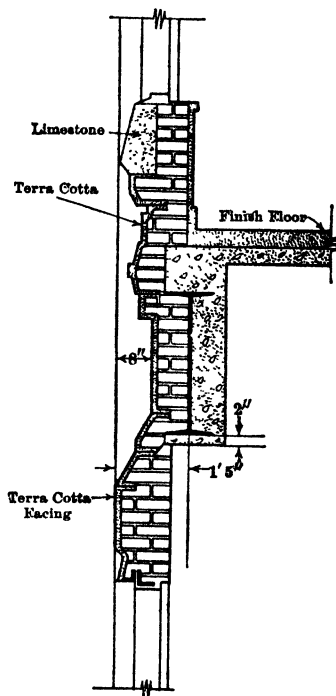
Section through Spandrel, 40 Wall St., New York City
